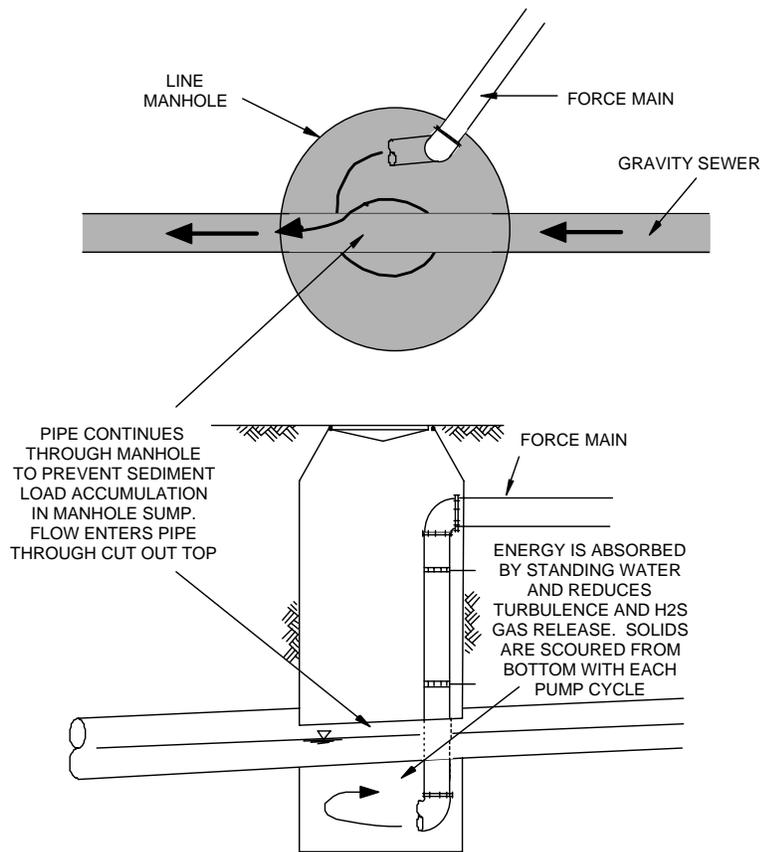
Line Manhole Turbulence Reduction Using Modified Manhole with Receiving Sewer Elevated (Plan and Section Views)
